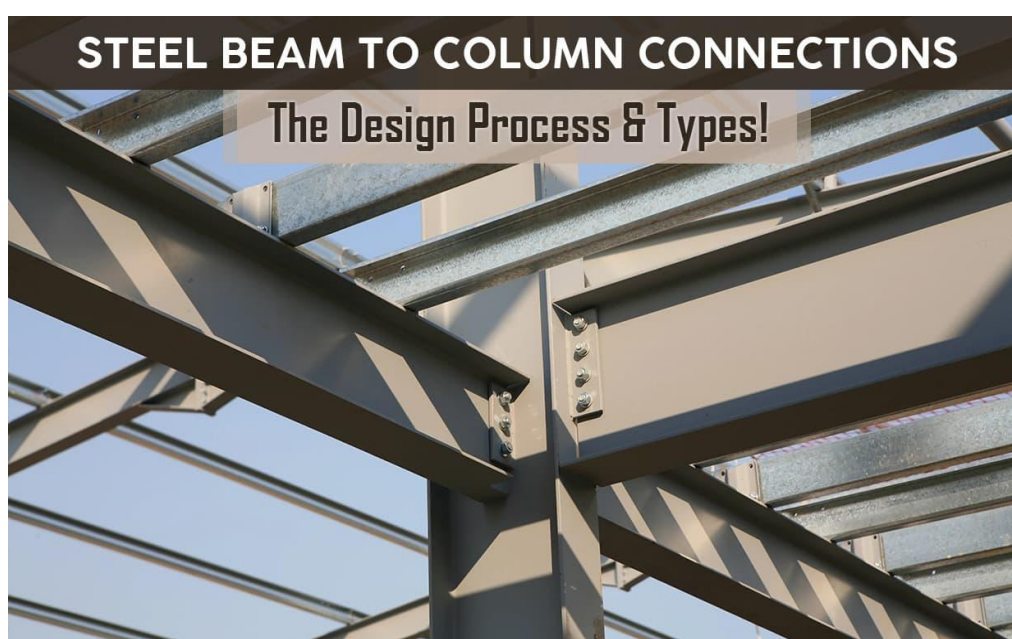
Steel Connections and Bracing Systems for Structural Stability
